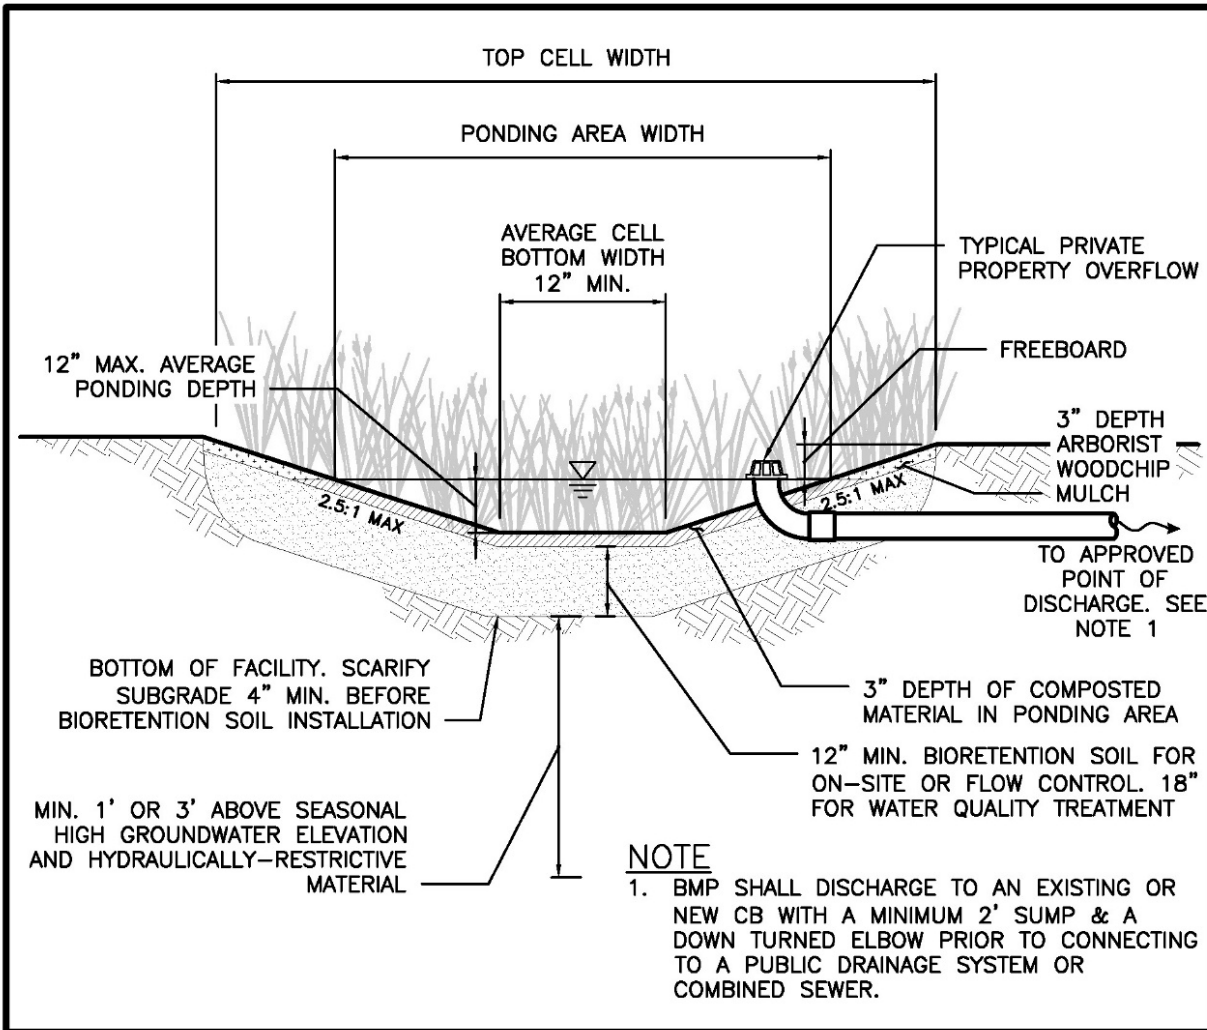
Infiltrating Bioretention Facility with Sloped Sides (without Underdrain).
